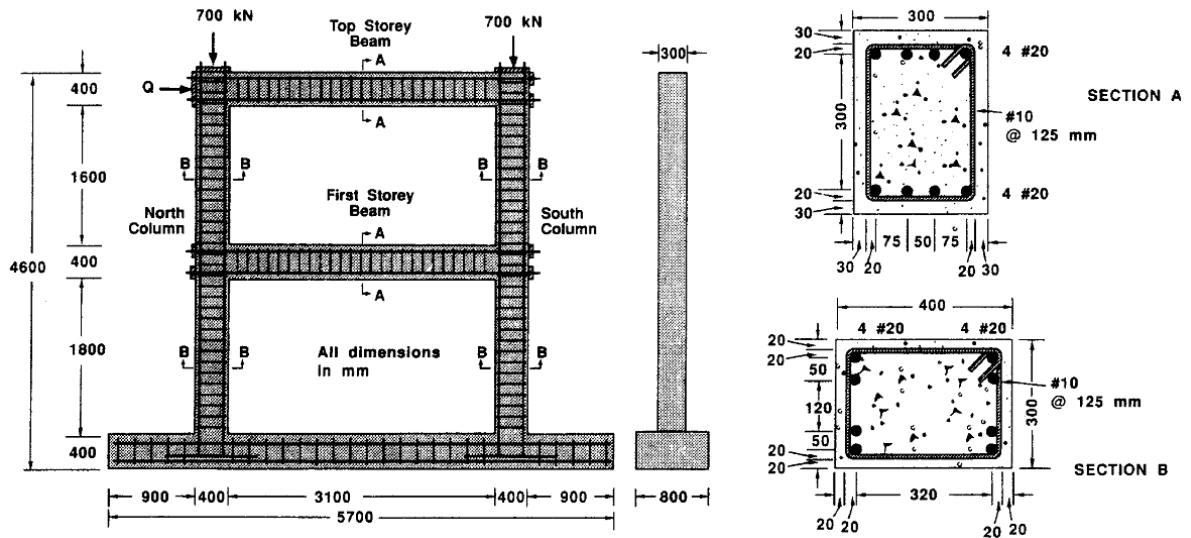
Test Frame Specimen Structural Details (adapted from Vecchio and Emara, 1992)
